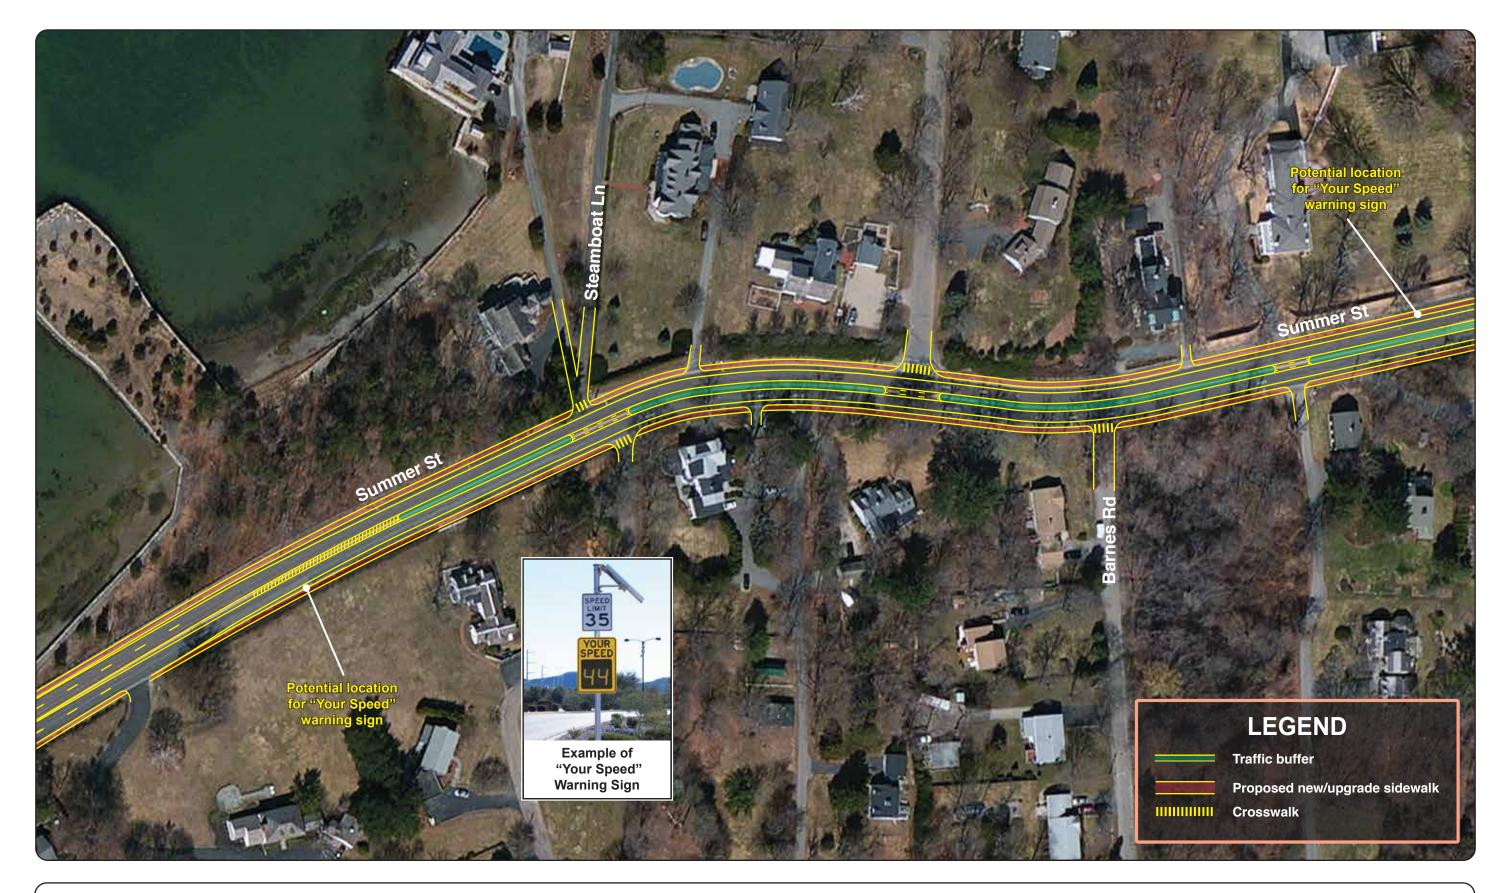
Proposed Long-Term Improvement Conceptual Plan: Summer Street in the Residential Area Summer Street/George Washington Boulevard in Hingham and Hull
